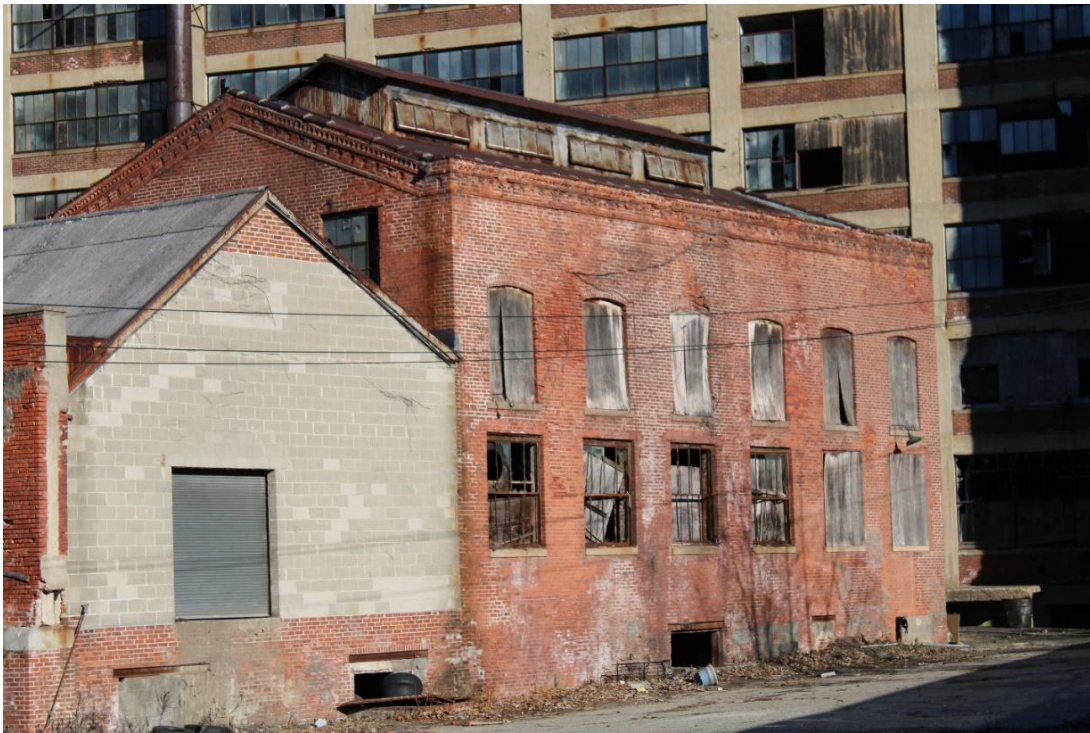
East elevation of the original boiler house (building 5/6). Photo facing northwest.
